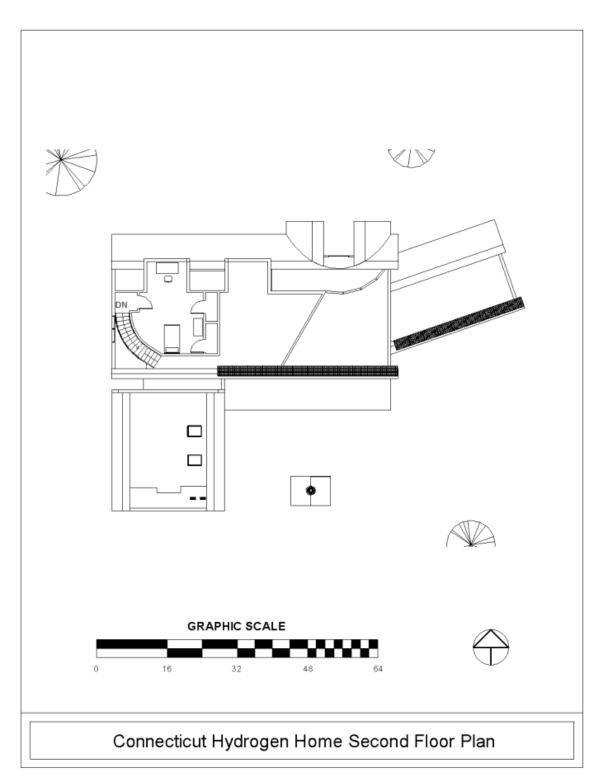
Figure II. New Hydrogen Home in Wallingford, CT First Second Plan
